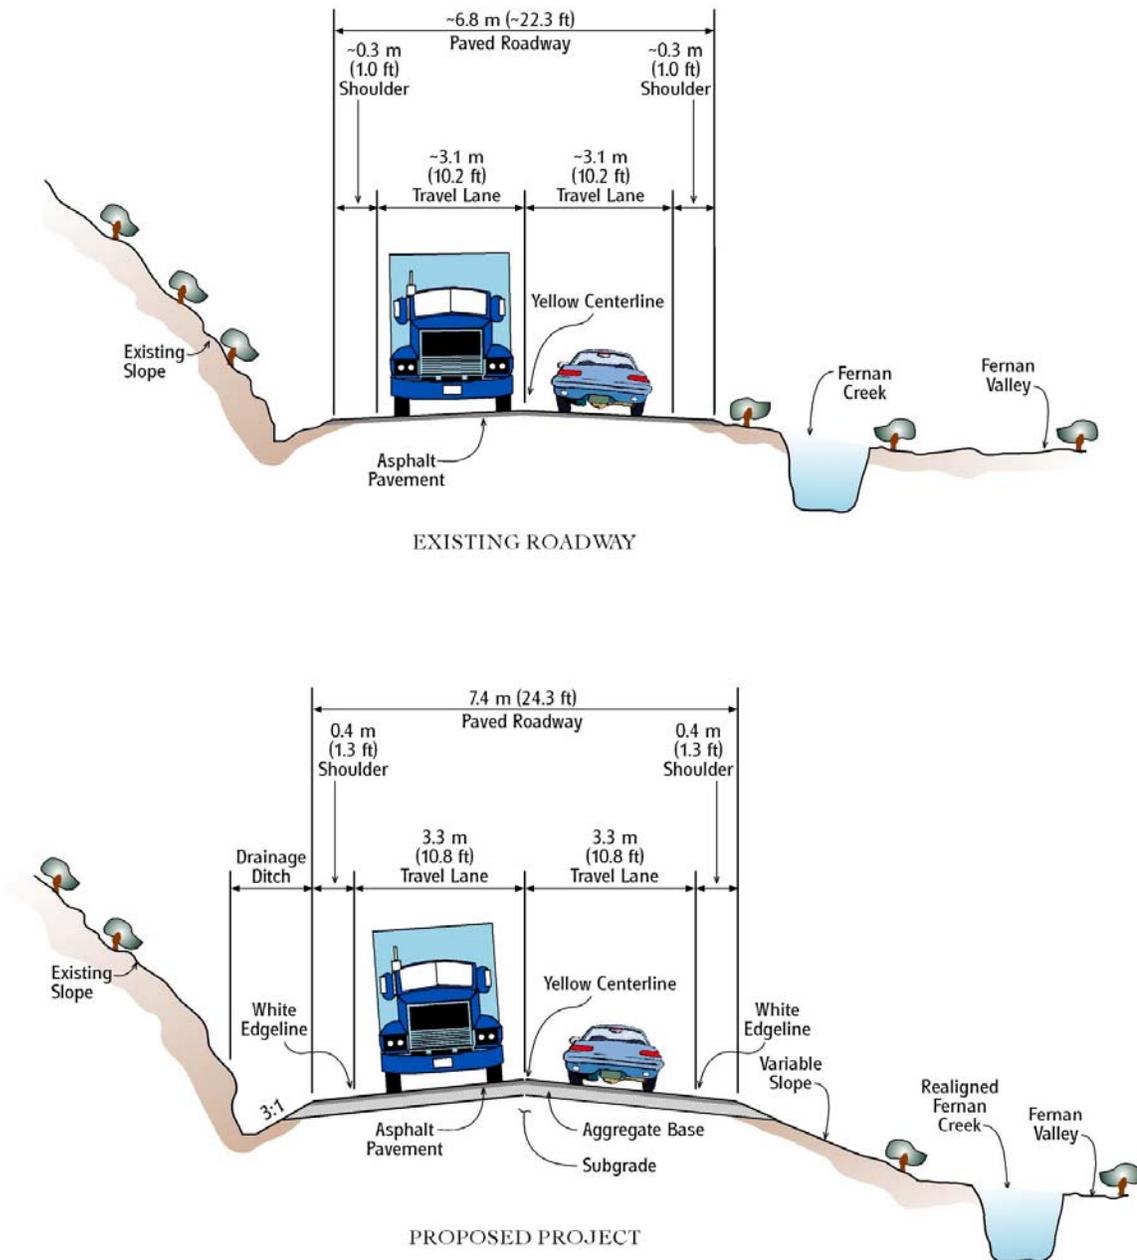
Schematic Cross-sections of Existing and Proposed Roadways in Segment 2.
